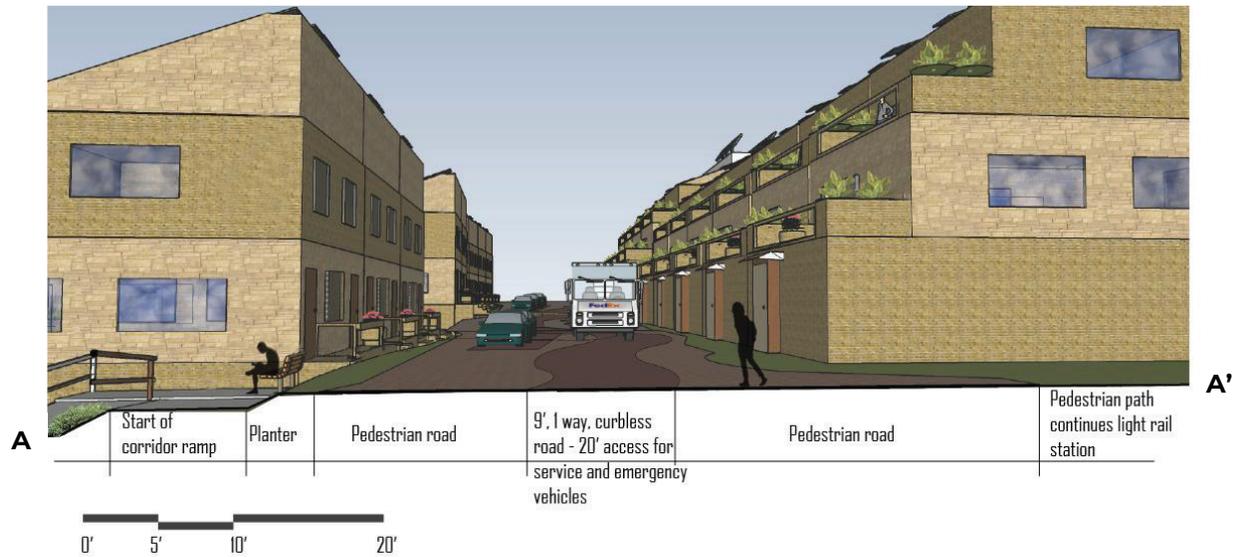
Section looking west through the designed woonerf street in the Terraced Gardens.
